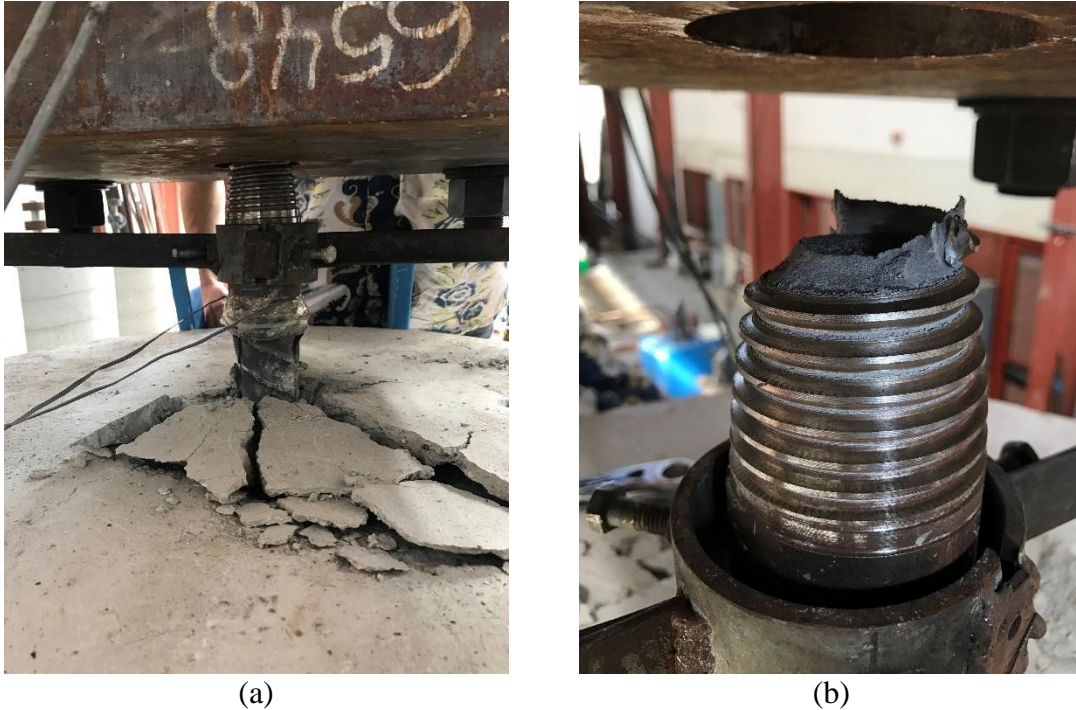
Fracture of Friction-Welded Header in Specimen #1: (a) Damage at Bar-Concrete Interface; (b) Closeup View of Header Post-Fracture
